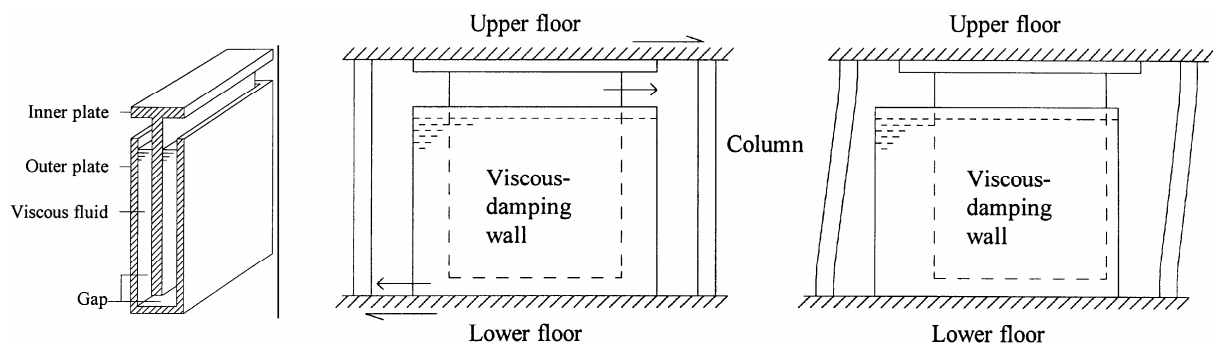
Viscous damping wall unit, Yeung¹⁴
